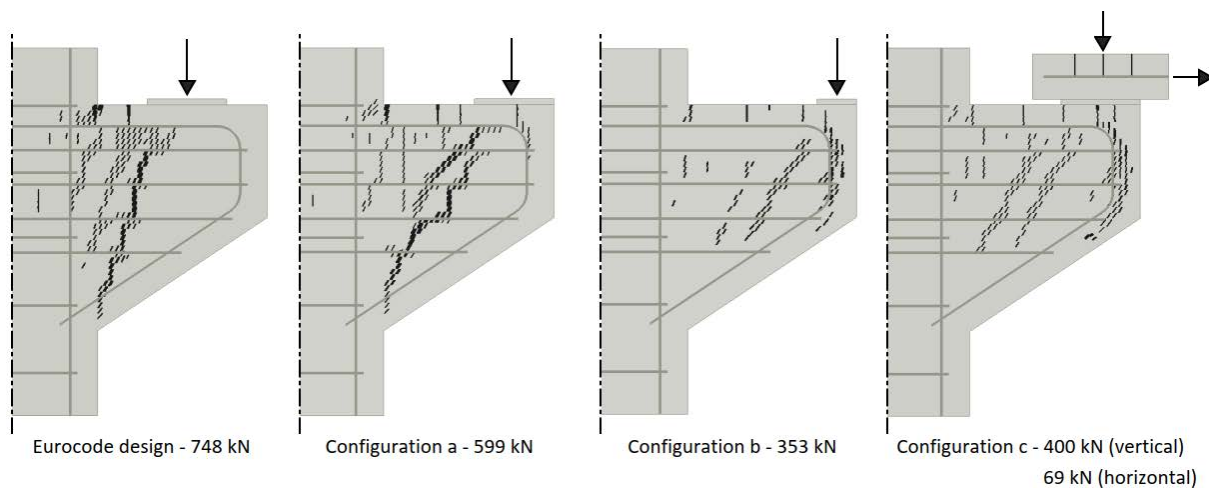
Cracks in numerical model at failure load for Eurocode design and configurations a, b and c (cracks with a crack width larger than 0,05 mm are shown).
